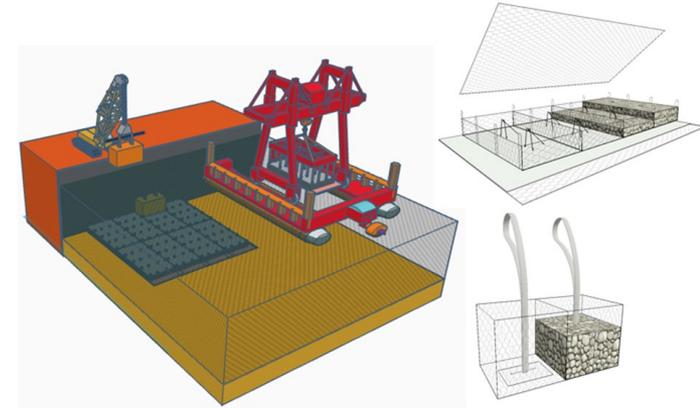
Installation scheme for prefilled Reno mattress® (by pontoon) and Gabions (by crane)
